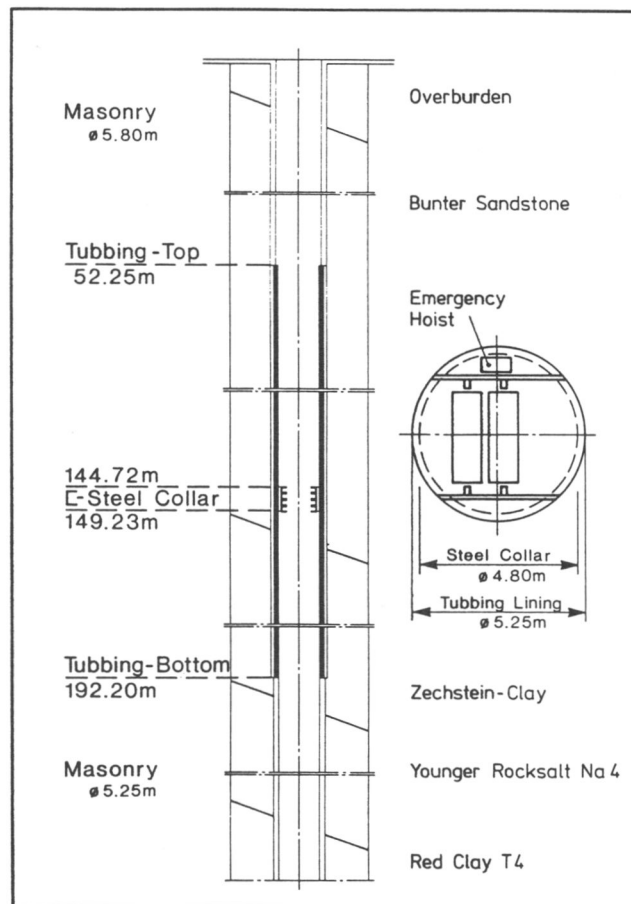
Shaft Salzdetfurth 1 Existing Lining, Geology, Cross Section
